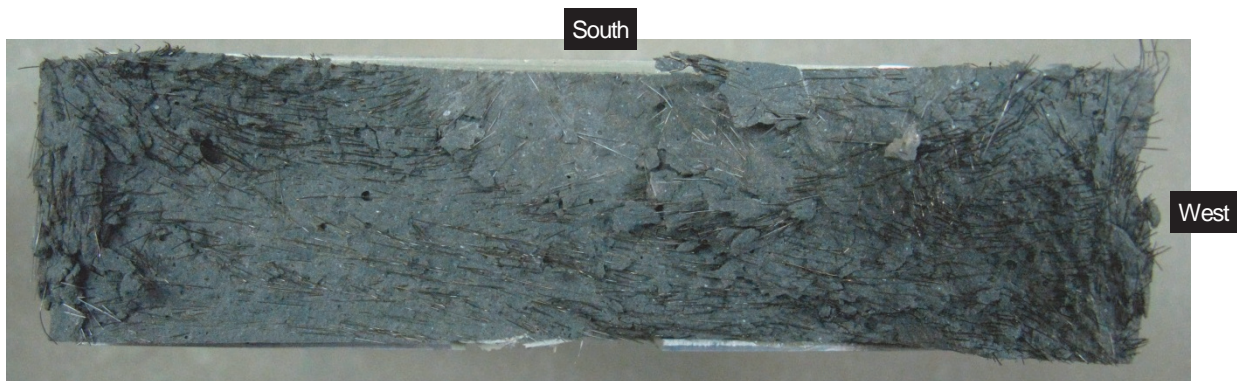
Fatigue fracture surface of S2.5-2 test specimen (lower half of the fractured specimen)
